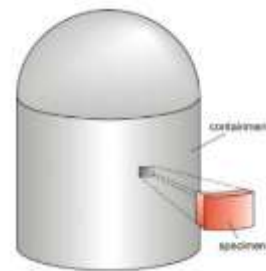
The specimen is cut out of the cylindrical part of the containment [18]
